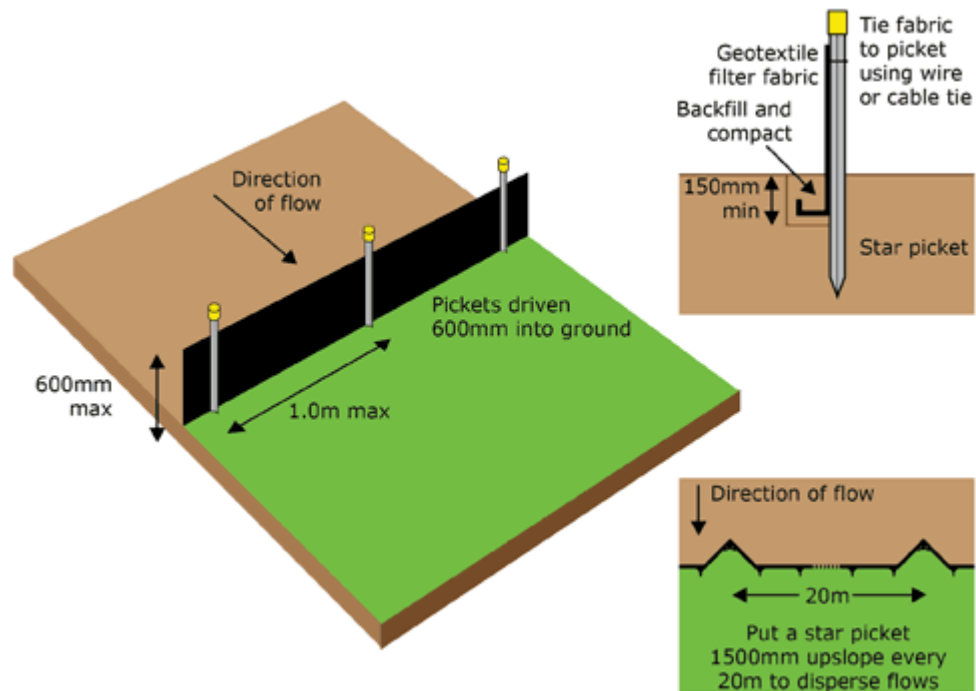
Typical Fence Installation (Melbourne Water, 2015)
